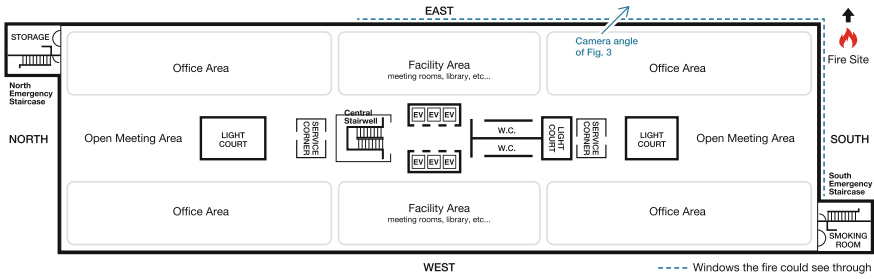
General floor plan from the second to the sixth floors in the subject office building
